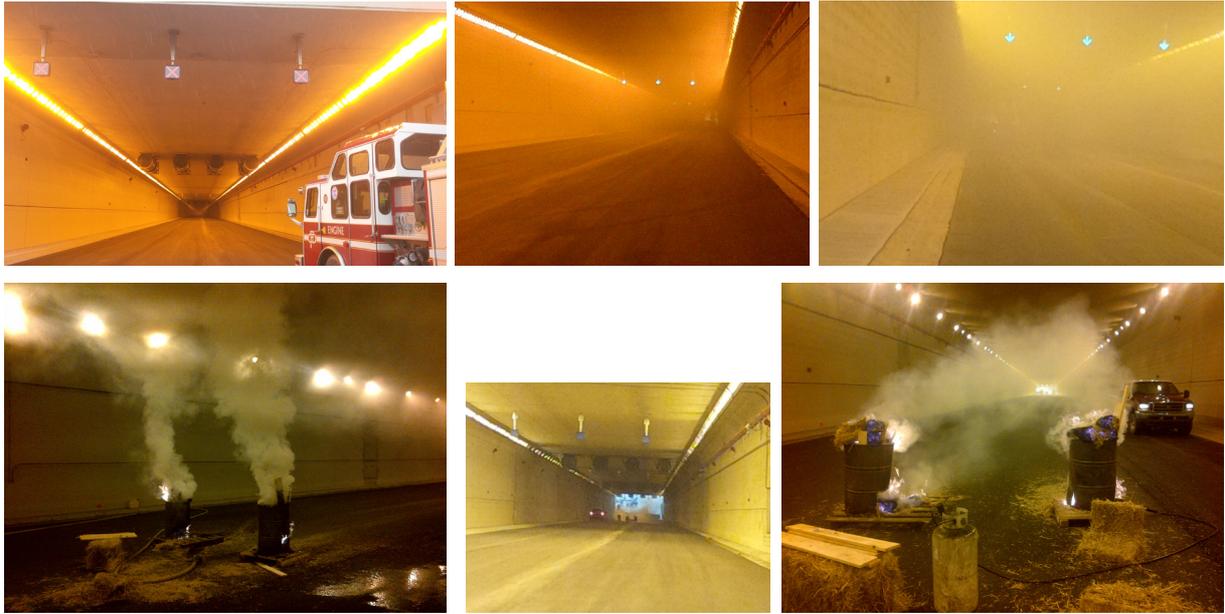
PHOTOS OF TUNNEL SMOKE TESTING
